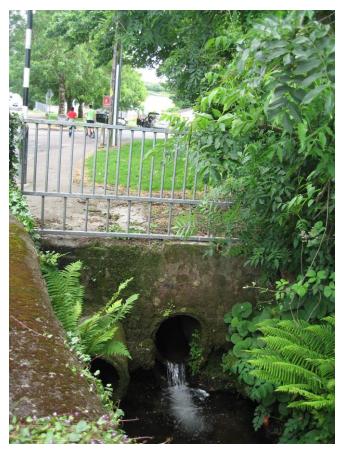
Tramore River emerging from culvert under Brook Avenue, looking south
